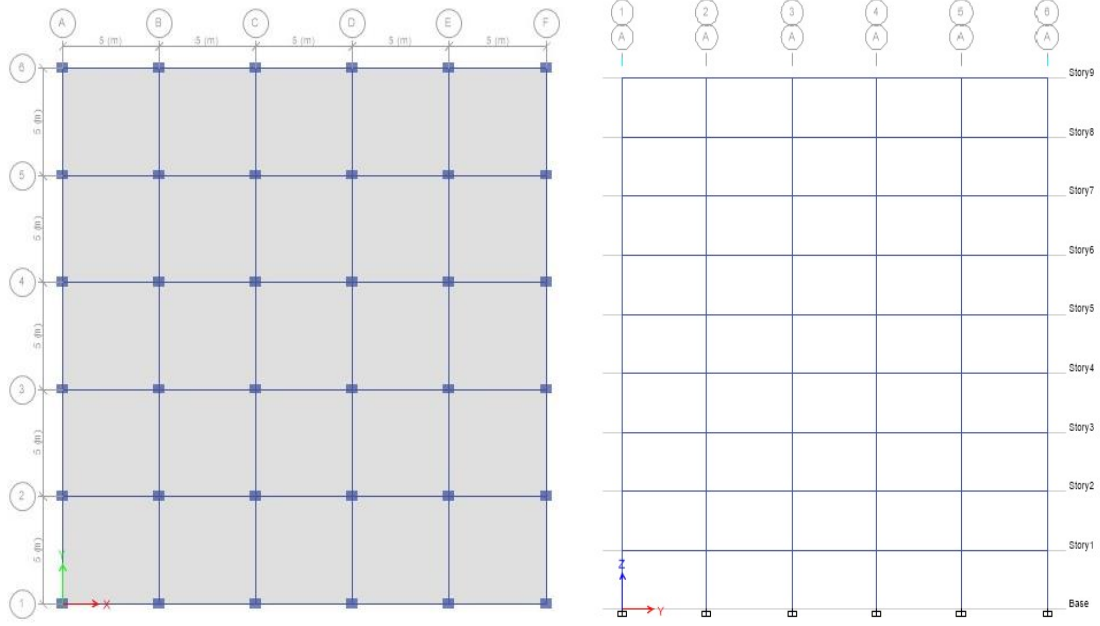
Plan of the model Figure 3.2: G+9 RC frame structure elevation
